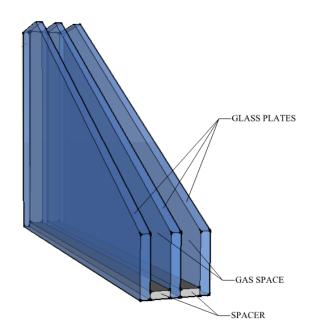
2 Corner cut of a triple pane insulating glass unit
